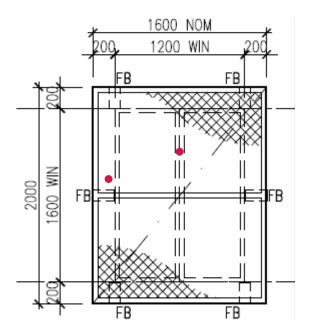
Drawing of debris screen frame showing dimensions, fixing bracket and impact locations
